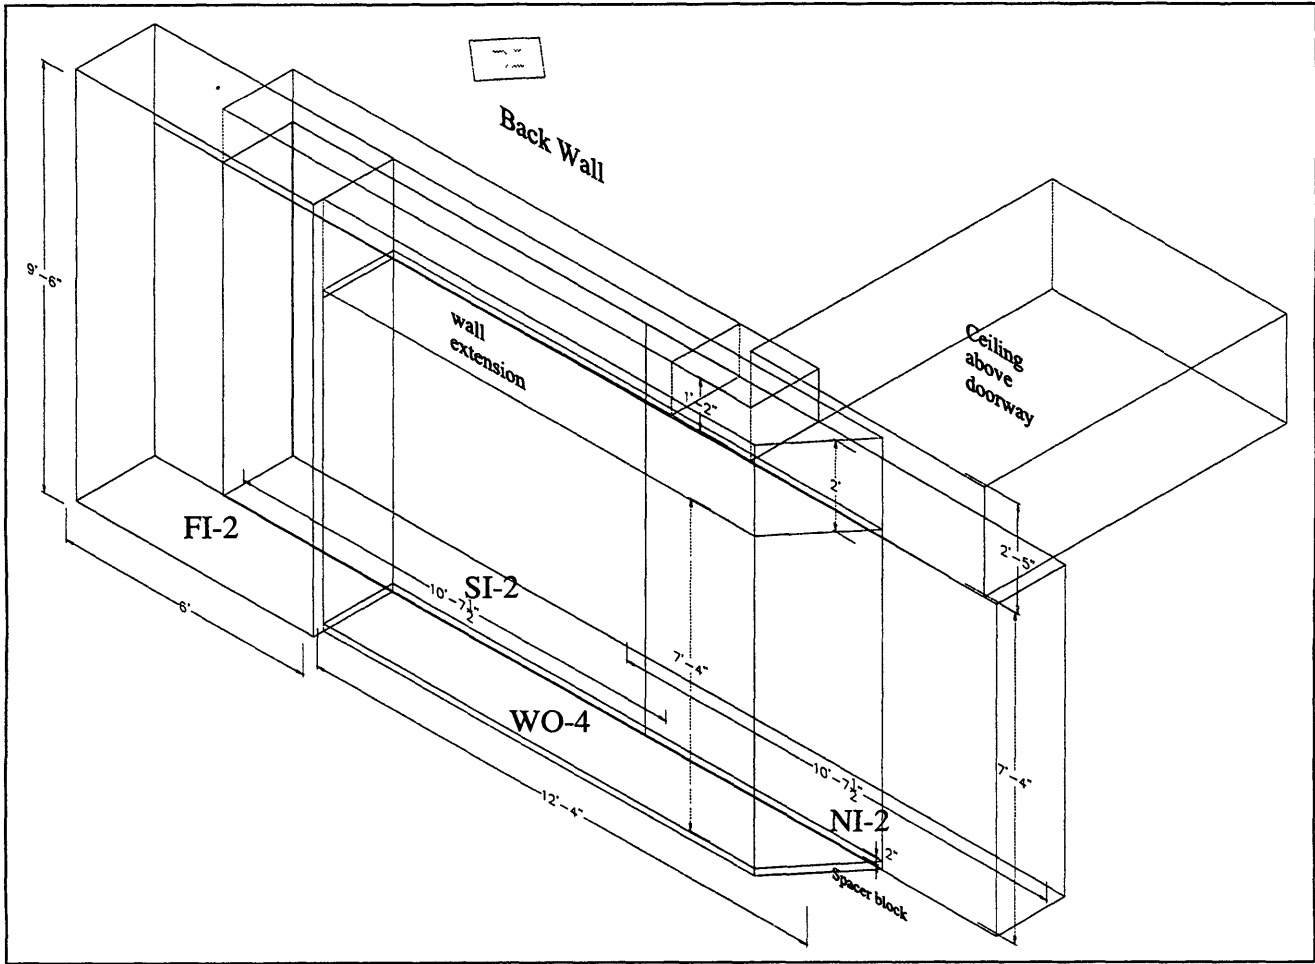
Back wall with spacer blocks. Possible entrance duct for ventilation system will be placed into the upper wall extensions.
